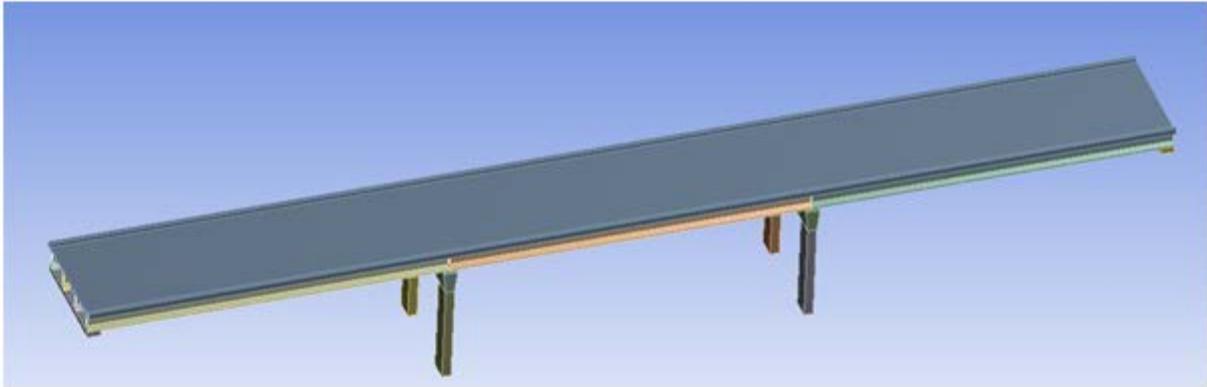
FIGURE : GEOMETRIC MODEL CREATED IN ANSYS (ELEVATION)
